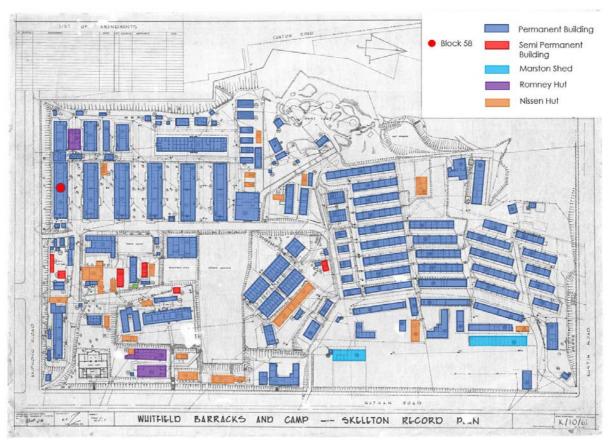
Type of buildings in Whitfield Barracks, based on the layout shown in Whitfield Barracks and Camp, Skeleton Record, 18 May 1961, Drawing No. K/10/61. (Source: Public Records Office, File No. HKRS913-1-122 with the Author's edition)
